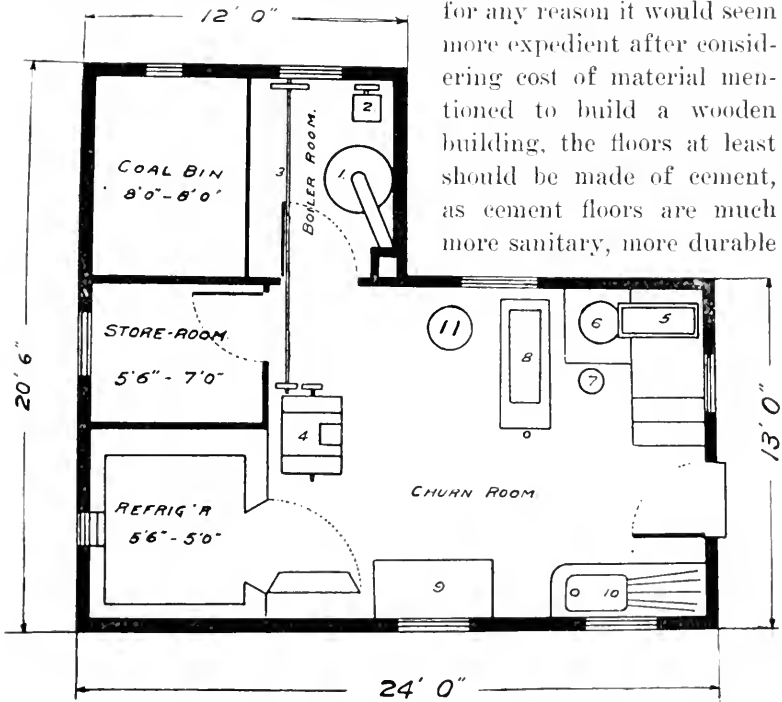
Floor plan of dairy for 20 or more cows, showing convenient arrangement of machinery.
